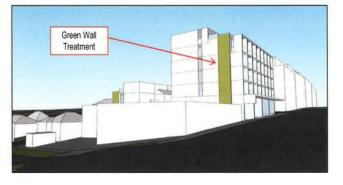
Victoria Road Frontage, looking west (Eastern Portion of the site shown undeveloped)
